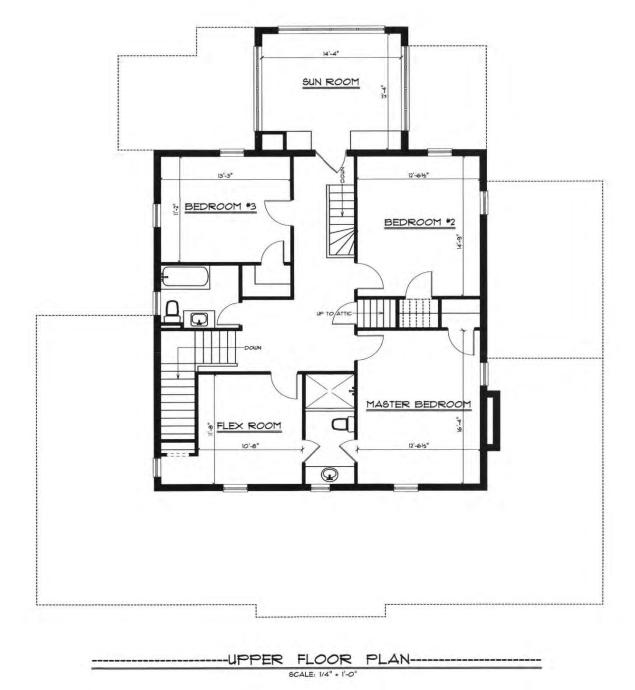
Second floor plan of the Edgar L. Ferran House. Source: Robert and Catherine Jones
